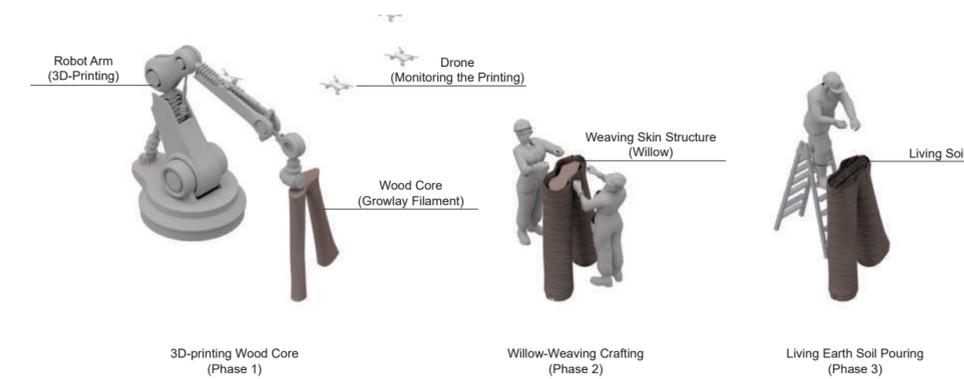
Construction Process of Living Soil (Proposed Design) (Modelled By Ming Hung Davis Mak)
